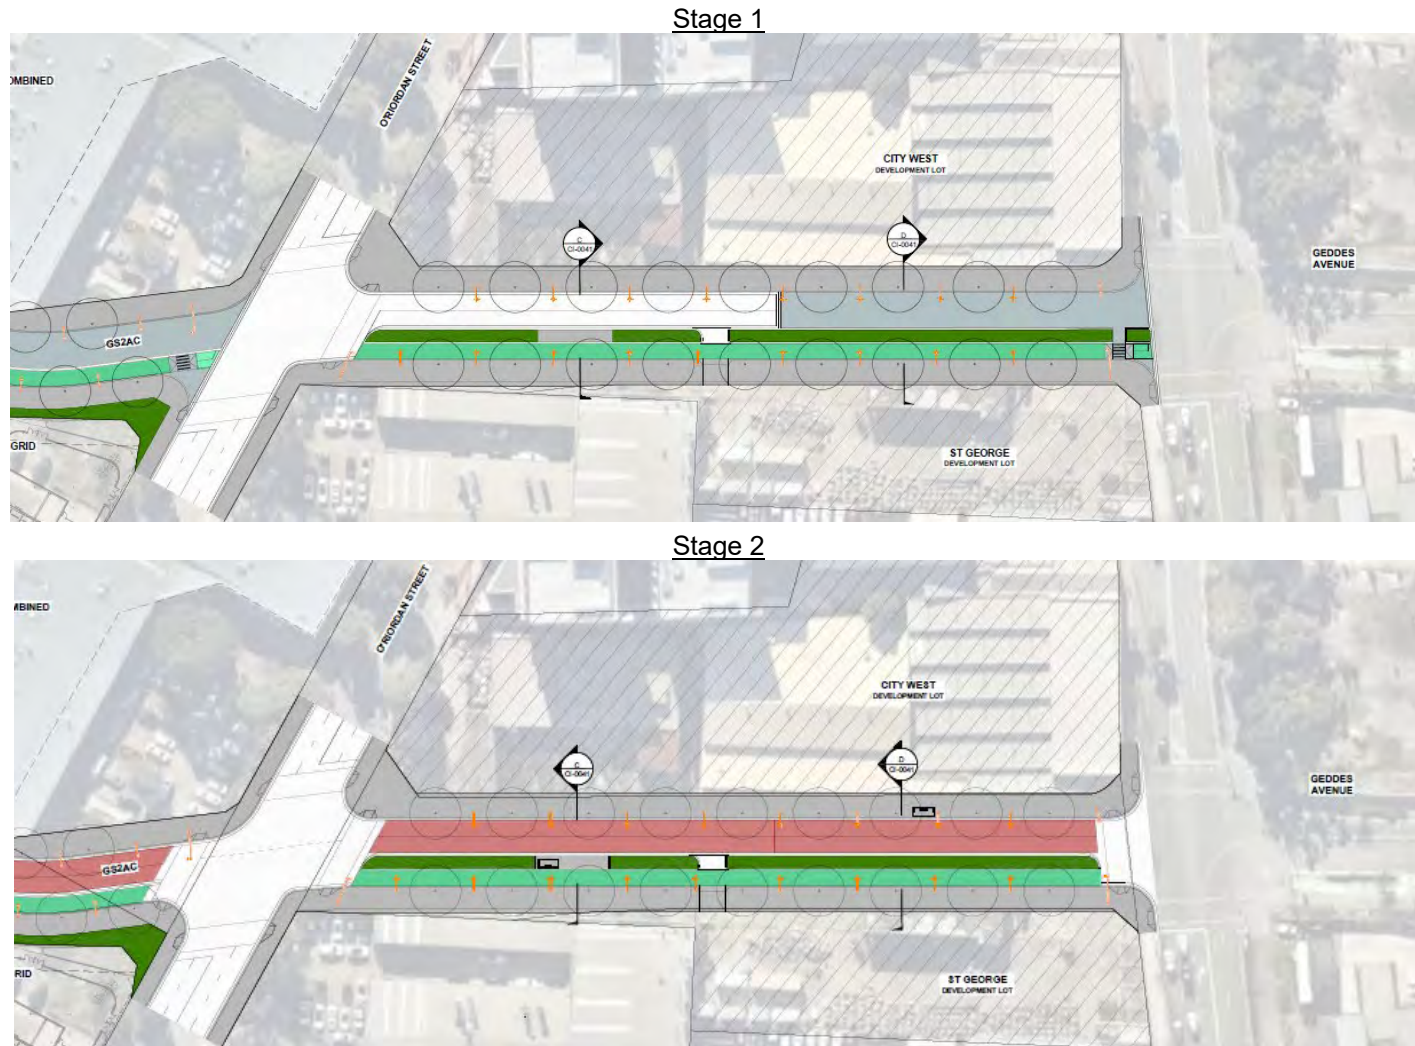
illustrates the GS2AC road design between Bourke Road / O'Riordan Street for Stages 1 and 2. Figure 32 illustrates the GS2AC design between O'Riordan Street / Botany Road for Stages 1 and 2.
